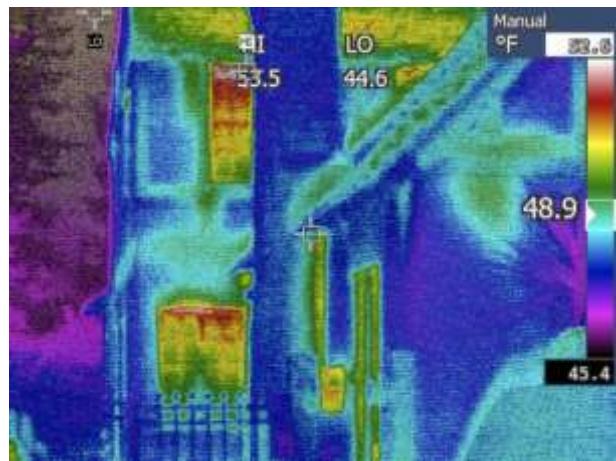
P2 Exterior, missed insulation at rim joists and windows
